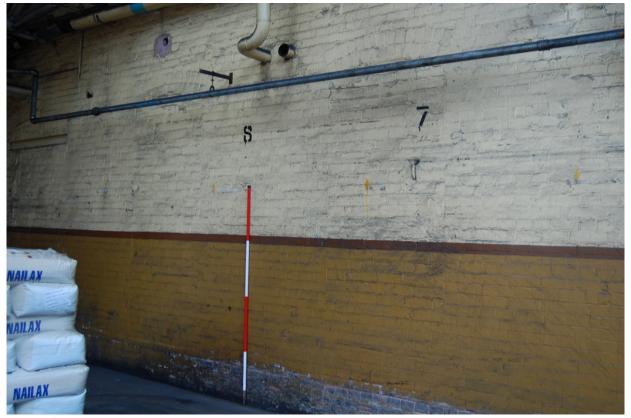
Building 8; east range south elevation, blocked segmental headed windows.
